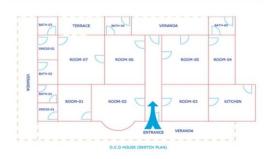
Commissioner House Initial Plan Sketch Source: Author
